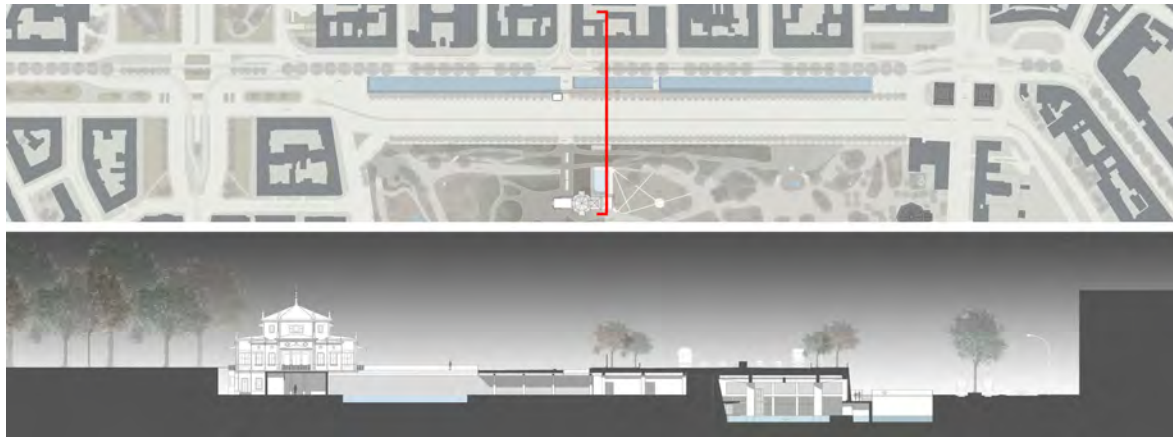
Plan and section (Marchesi - Schiavone, 2013)
